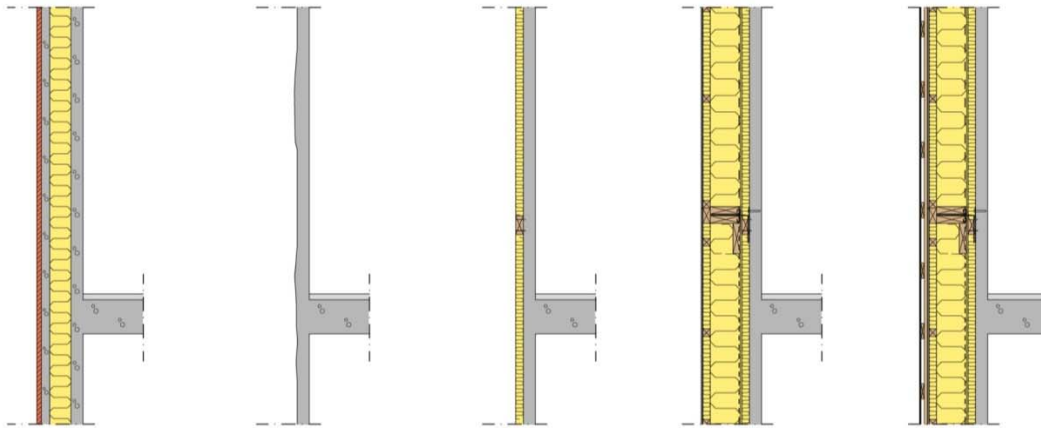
Process of facade retrofit. From left: original precast sandwich element, stripped concrete shell, adjustment layer to receive TES facade, prefabricated elements assembled on concrete shell, cladding applied in-situ. (M3 Architects, 2012)
